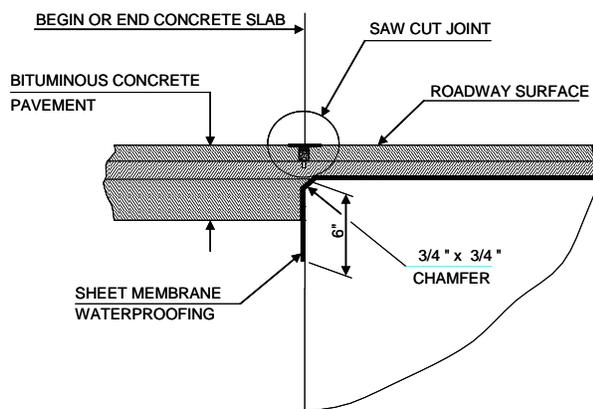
1 Saw Cut Joint Detail
